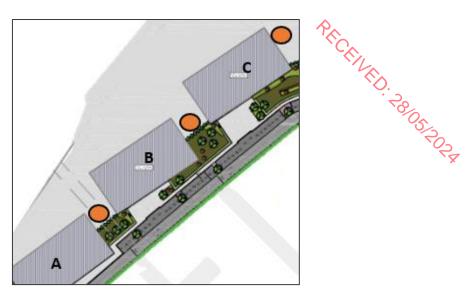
WSA locations shown orange – refer to Site Layout Drawing for detail.
